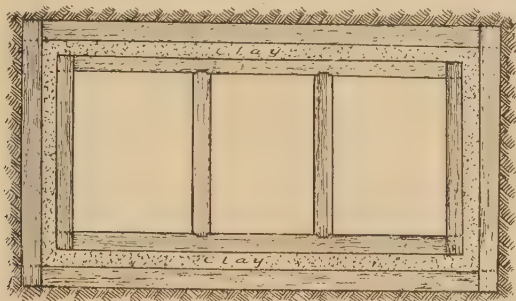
Clay packing between double shaft timbers to hold back water.
